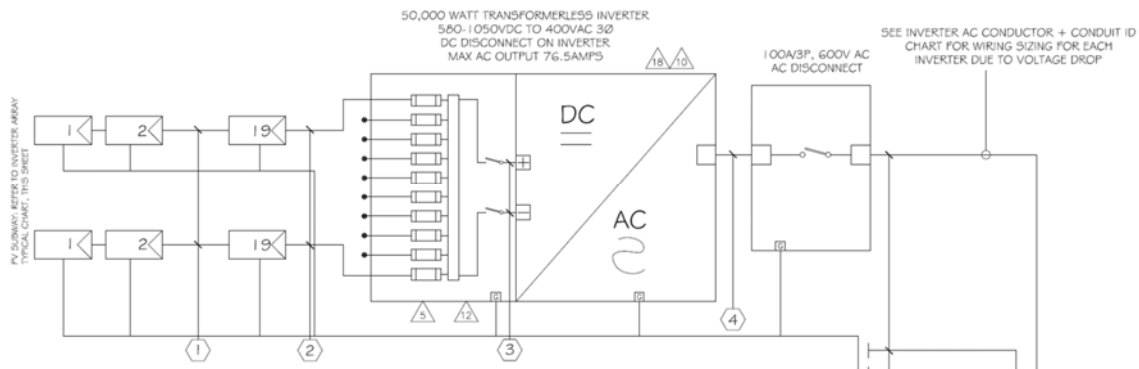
String of 19 PV panels and 10 such strings connected to one PV inverter.
